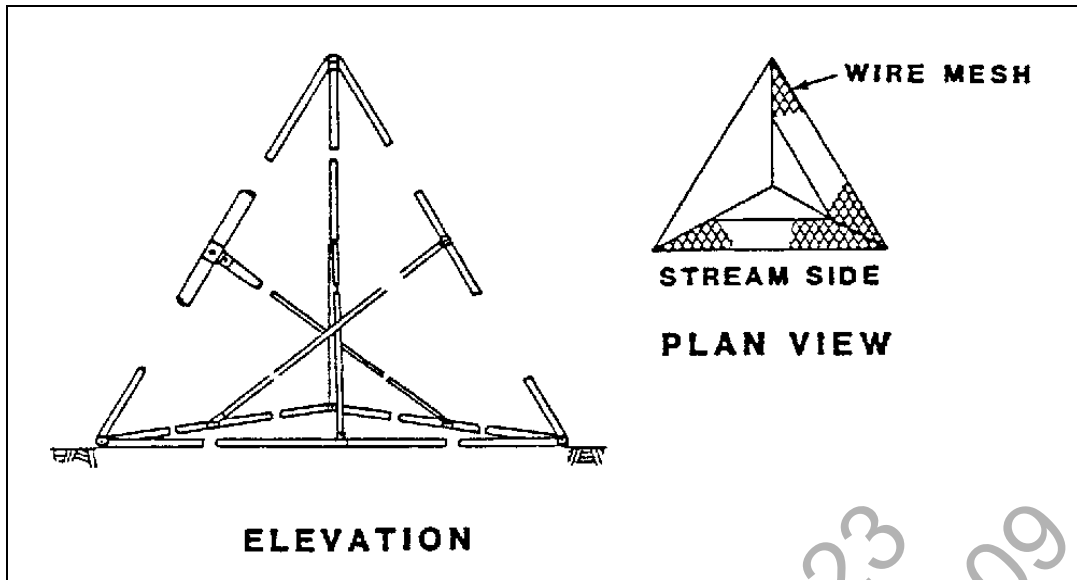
Typical tetrahedron design (after Brown).⁽²⁾
